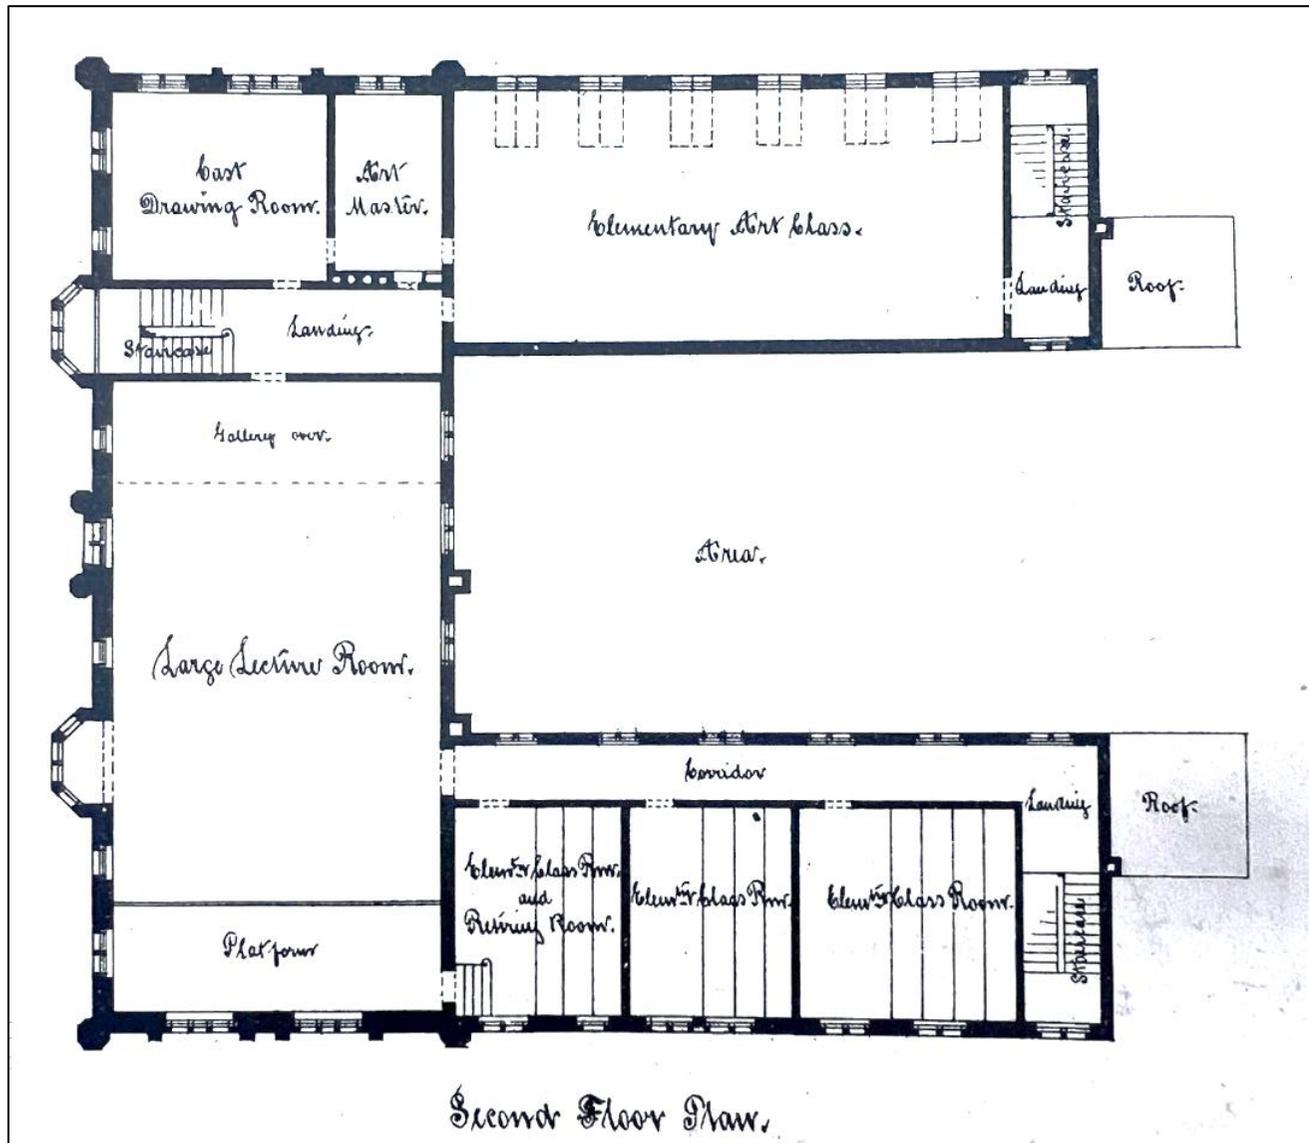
Second Floor Plan extract from HUD/ET/1/4: Site plan: Technical school and Mechanics Institute, Hughes 1881
